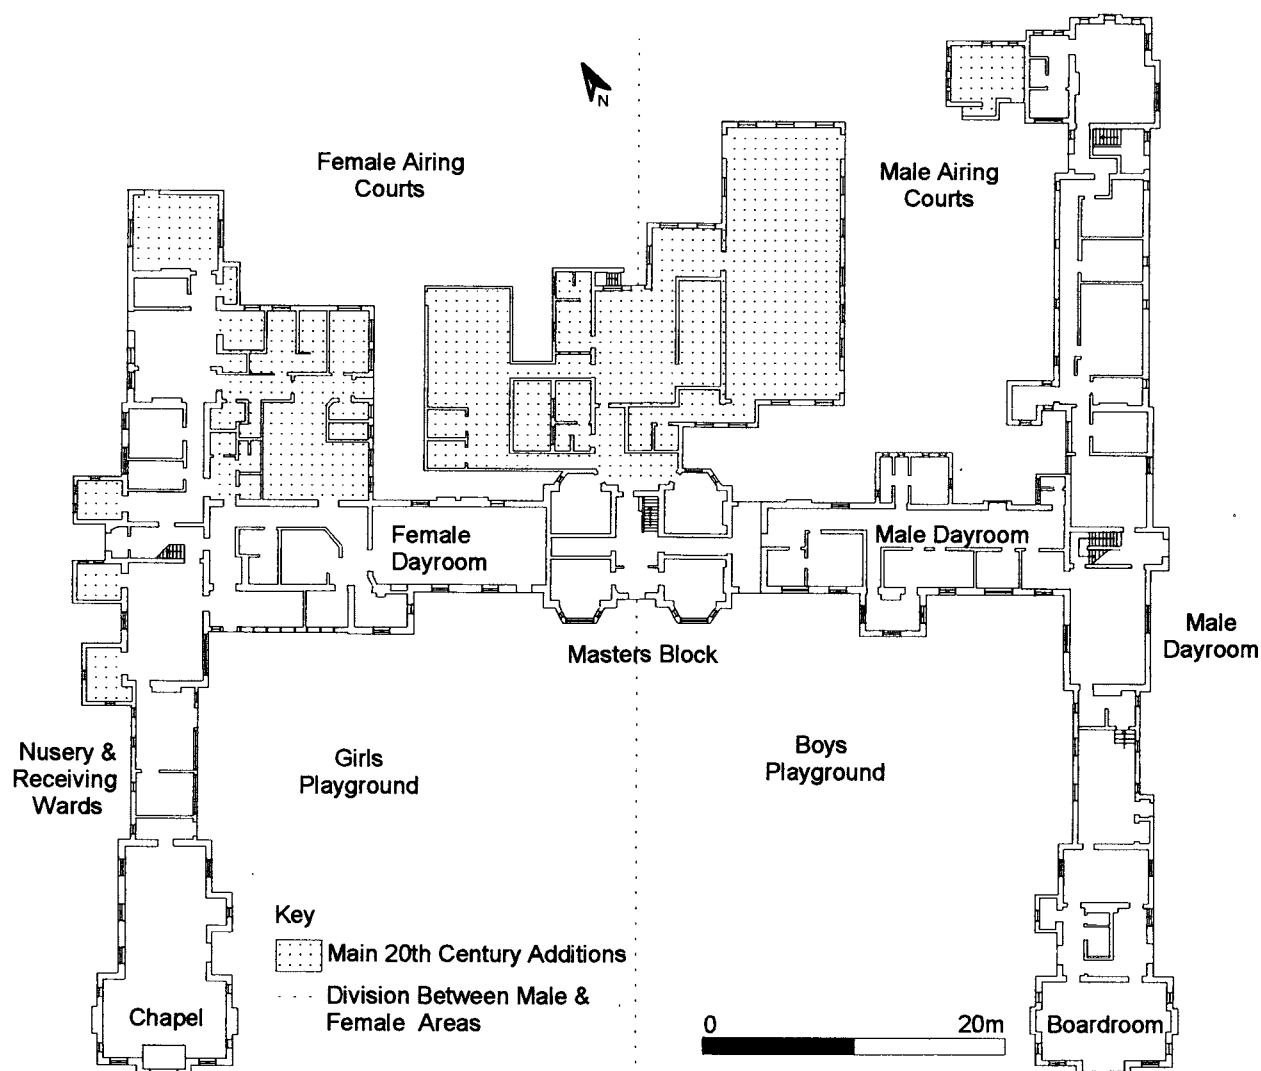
Ground floor plan of Billericay Union Workhouse.
